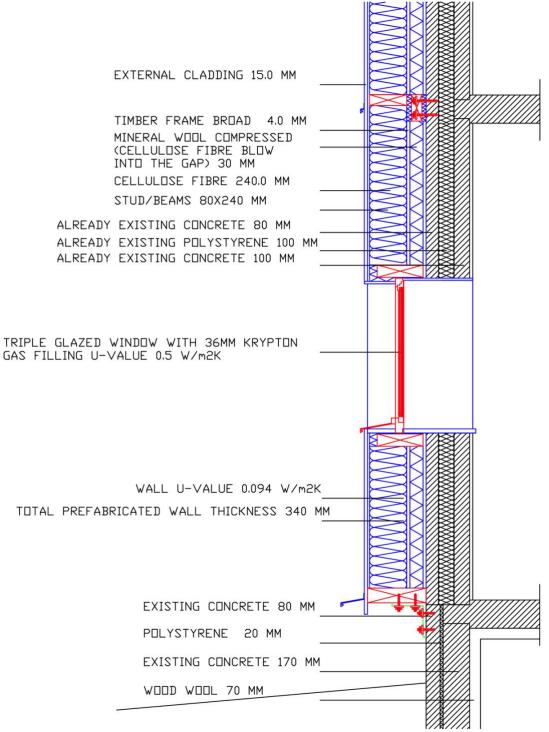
Detail drawing of the TES prefabricated facade attached onto the existing building facade with the materials labelling and the U-value of the window and facade.
